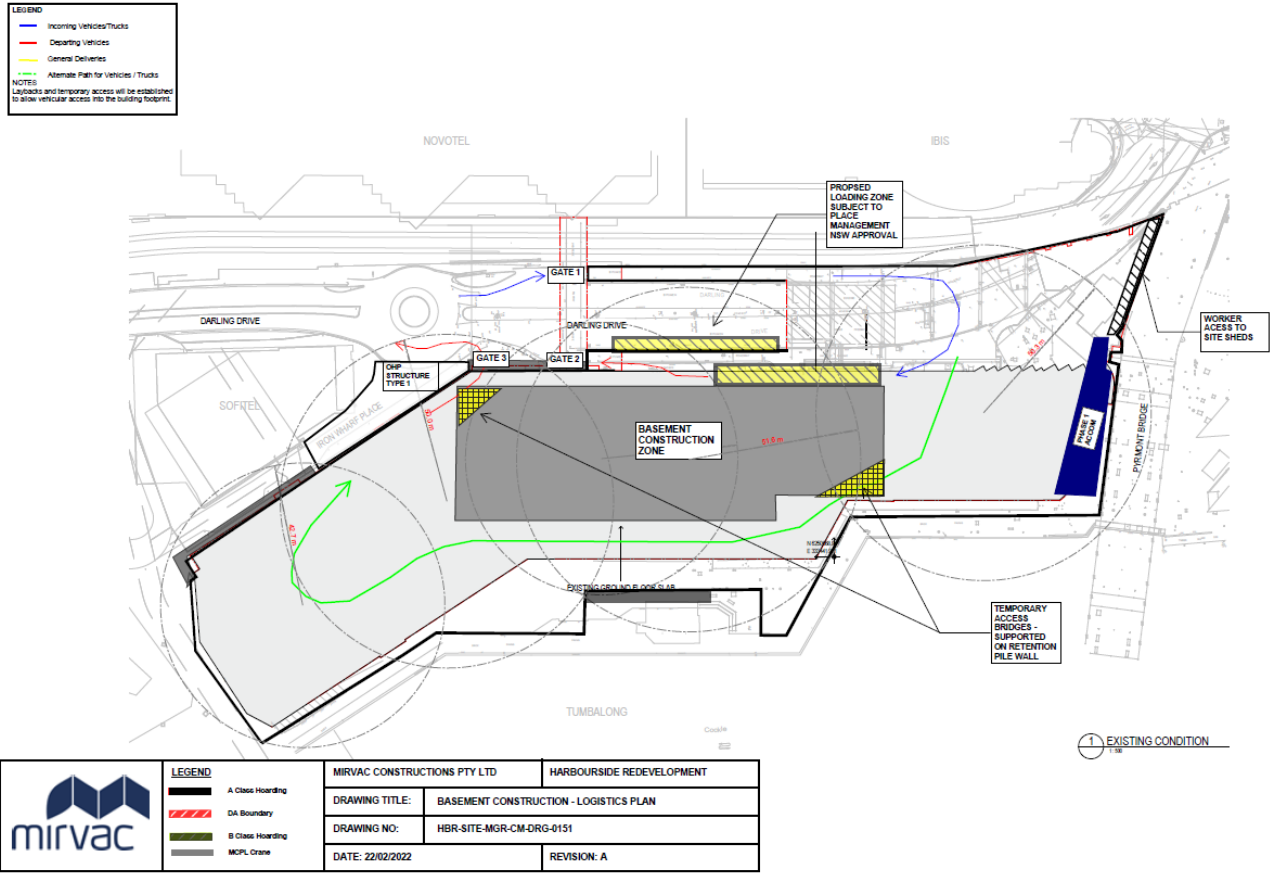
Vehicle Access & Egress Plan / Site Hoarding Plan
